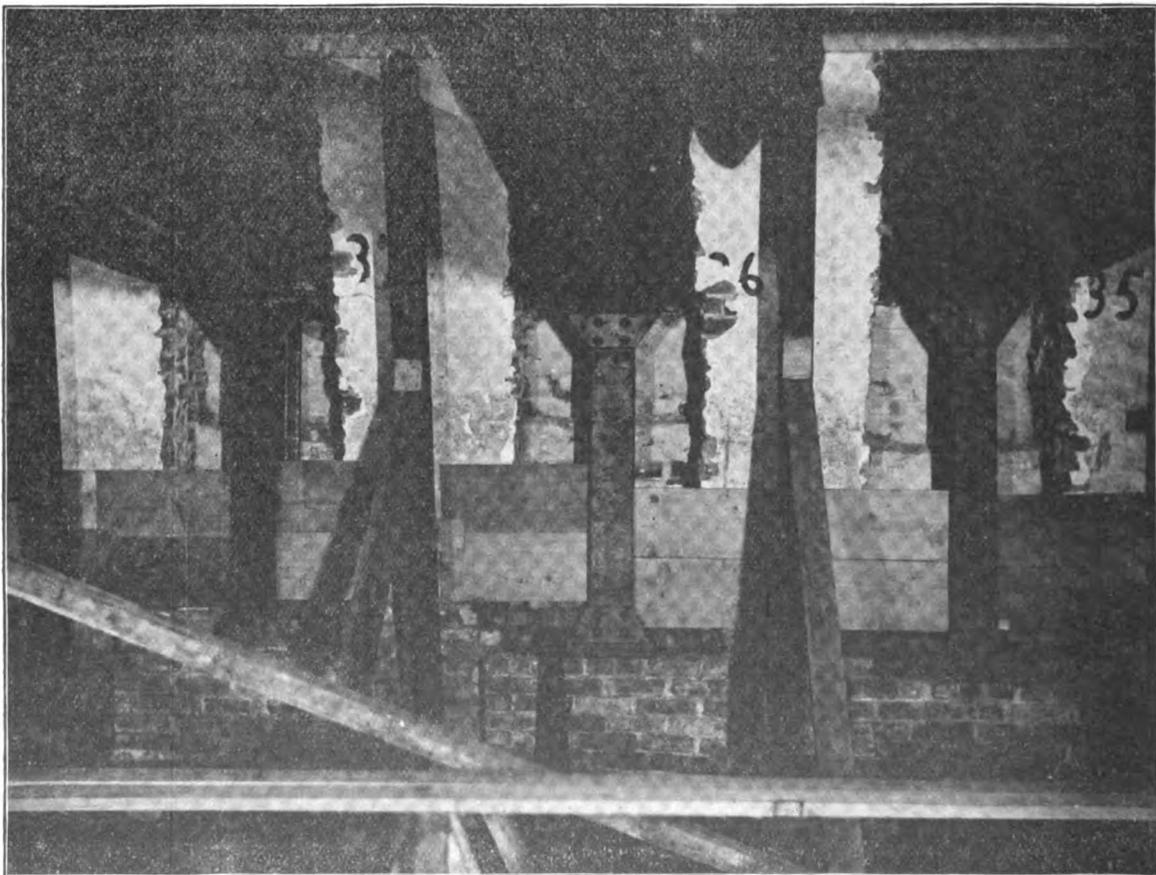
CENTER OF SOUTH WALL OF VAN BUREN STREET TUNNEL. nels, outlined by Mr. John Ericson, M. Am. Soc. C. E., City Engineer, Chicago, was published. The article included costs of various parts of the work, including approaches, tunnels proper, shoring and bracing of buildings, etc.
